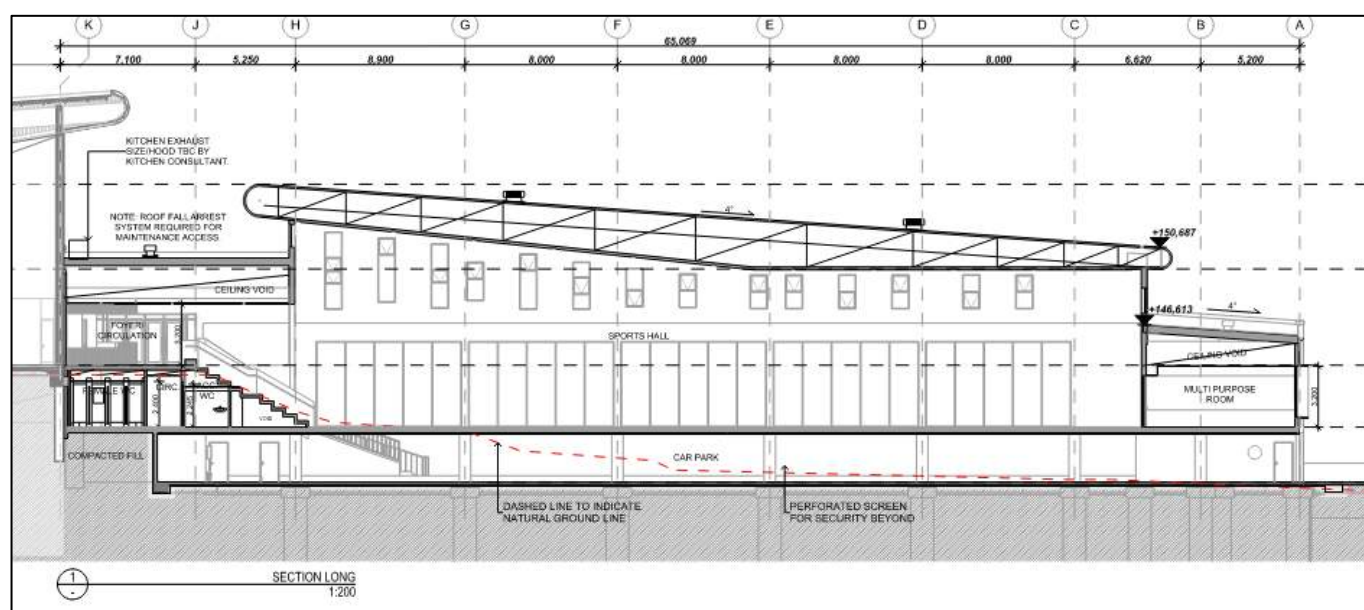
Section of proposed development (St Ives Indoor Sports Complex, dated 8 April 2021, JDH Architects)
